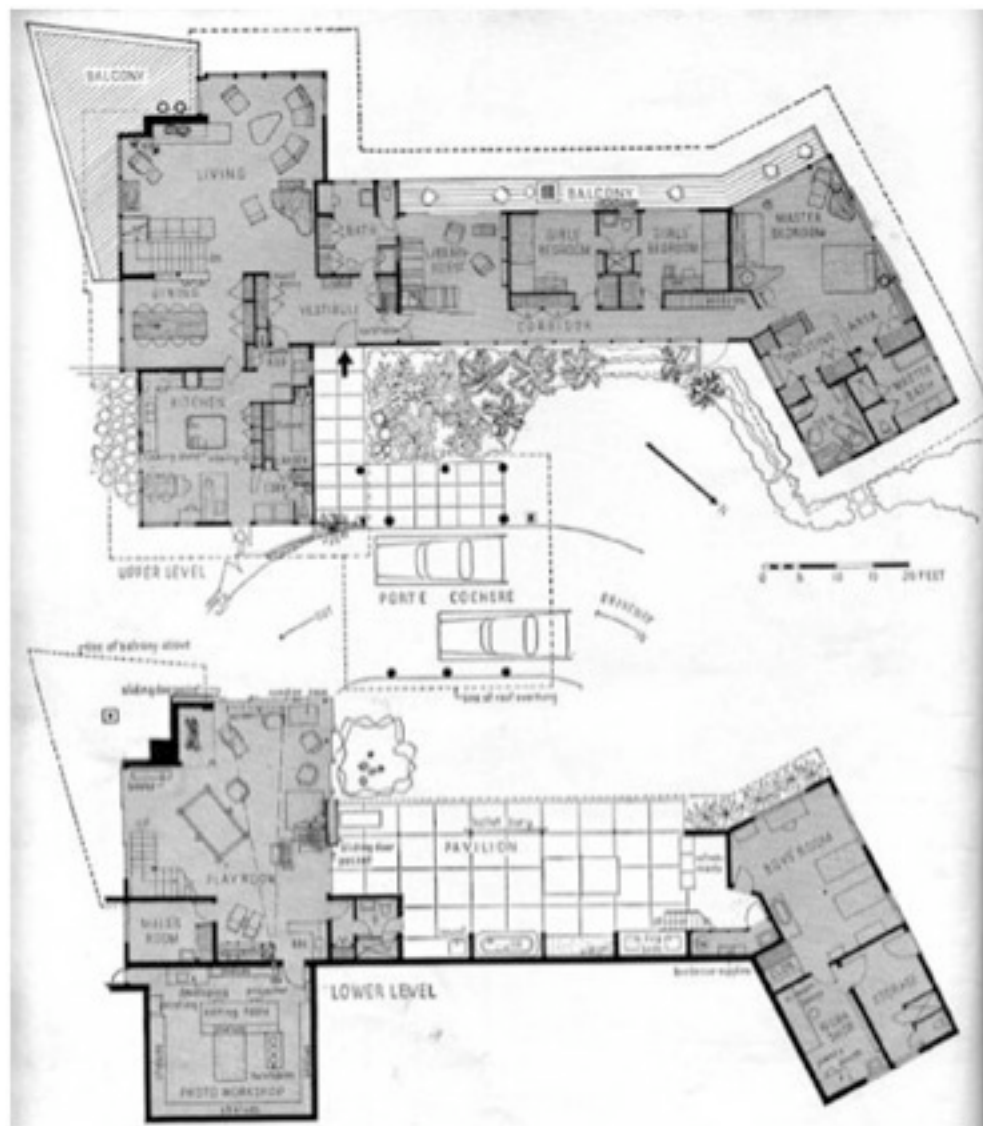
Floor plans of the Liljestrand house. Image provided by Bob Liljestrand
